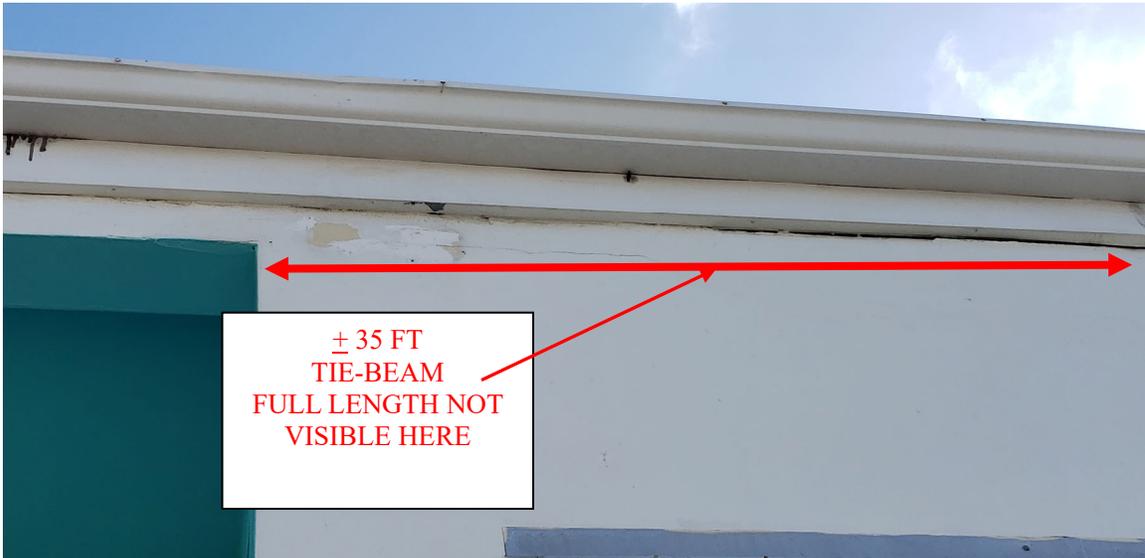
Location 33: Approximately 35 ft long new 8x24 horizontal tie-beam at roof level. See detail 10/S106.
